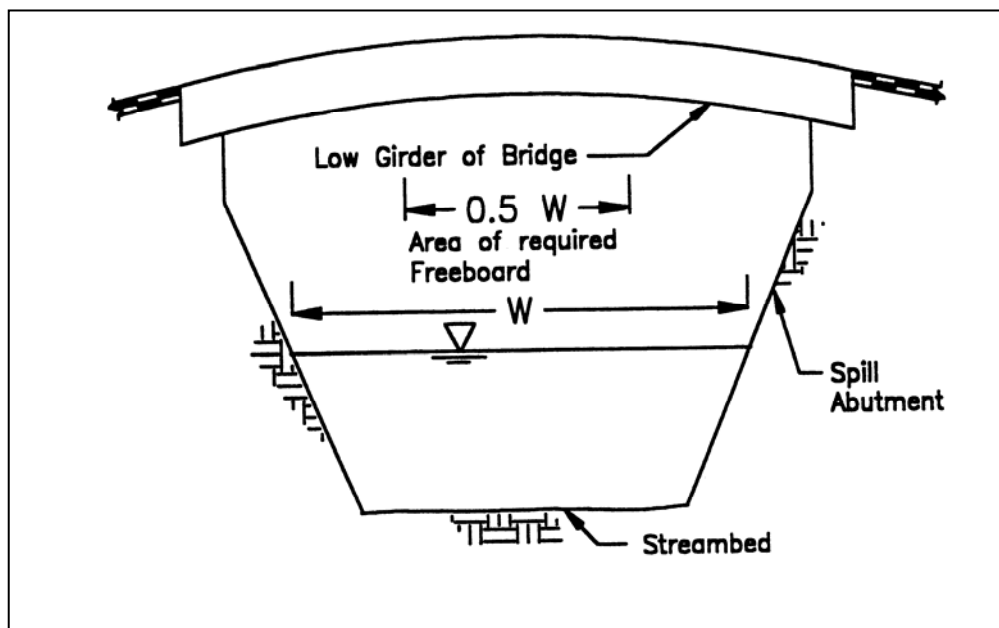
Freeboard for Bridge with Crest Vertical Curve
